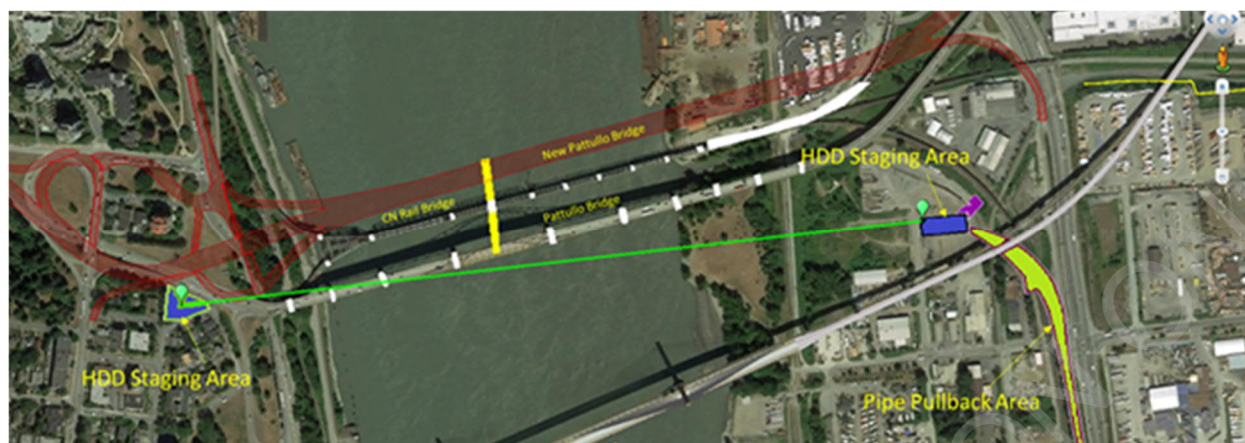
Route A1 and Conflict with Pattullo Bridge Piers
